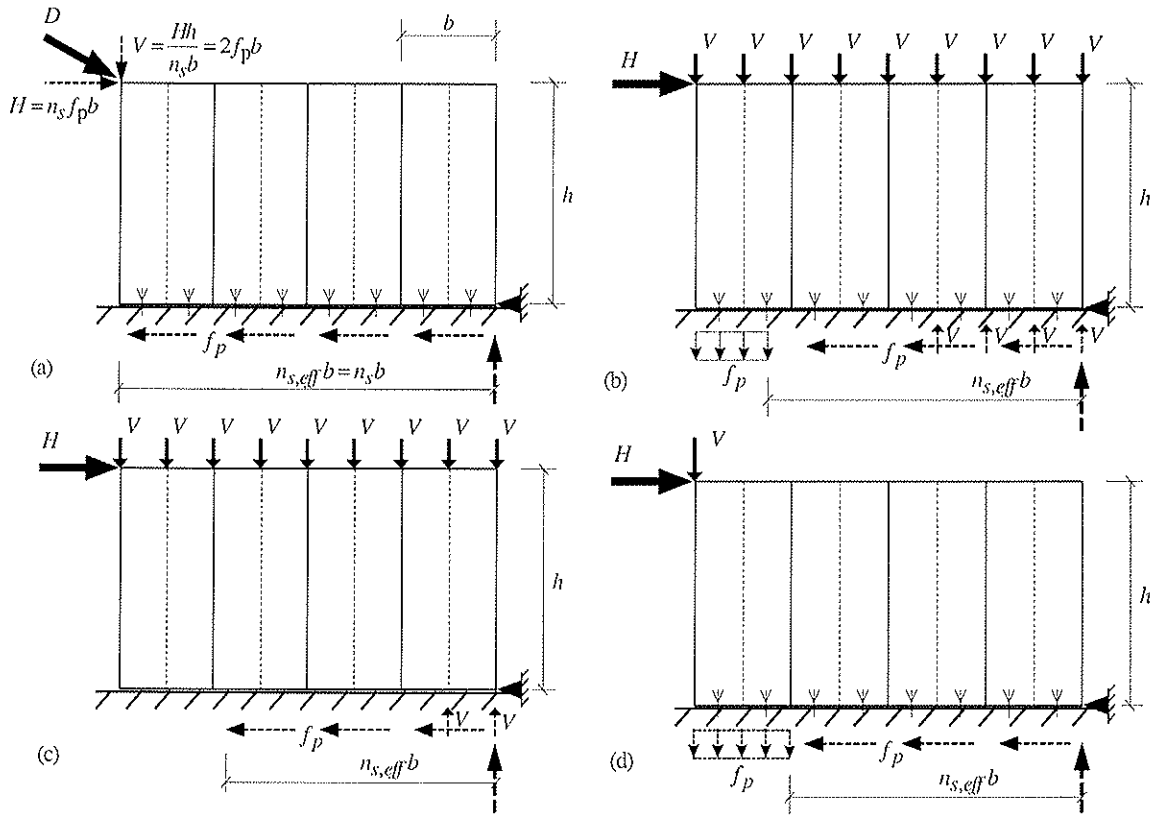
Shear walls on rigid foundation with different boundary and loading conditions: (a) Fully anchored bottom rail – diagonal load that corresponds to a fully anchored leading stud; (b) Fully anchored bottom rail – vertical loads on all studs; (c) Not anchored bottom rail – vertical loads on all studs; and (d) Fully anchored bottom rail – vertical load on leading stud. The dashed arrows are reaction forces relative to the bottom rail.
